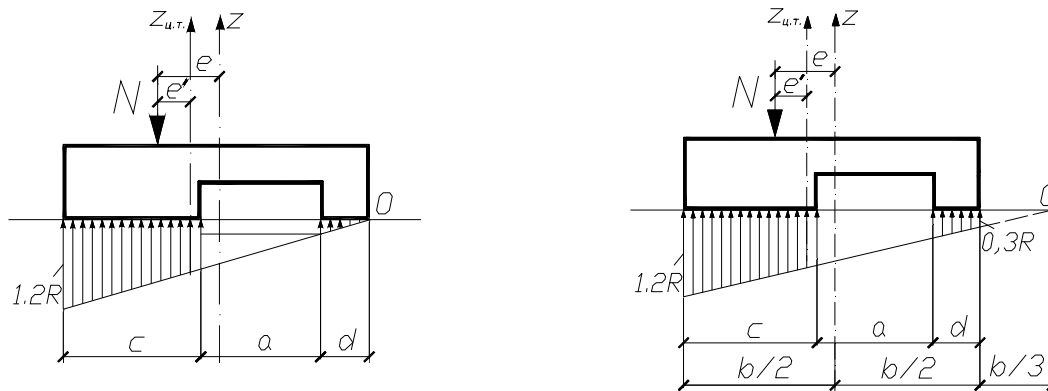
Eccentrically loaded strip foundations of retaining walls with asymmetrical cut-outs on the bottom
